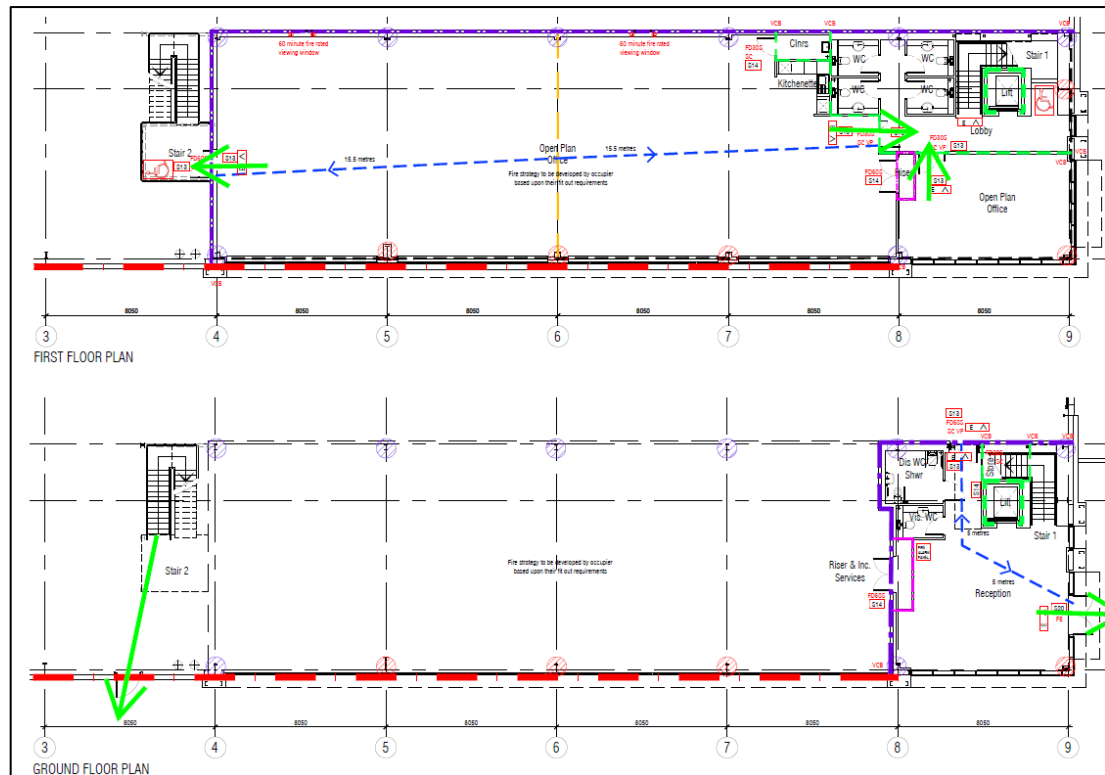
Ground and first floor office area showing protected stair and accommodation stair, storey and final exits shown by green arrows
